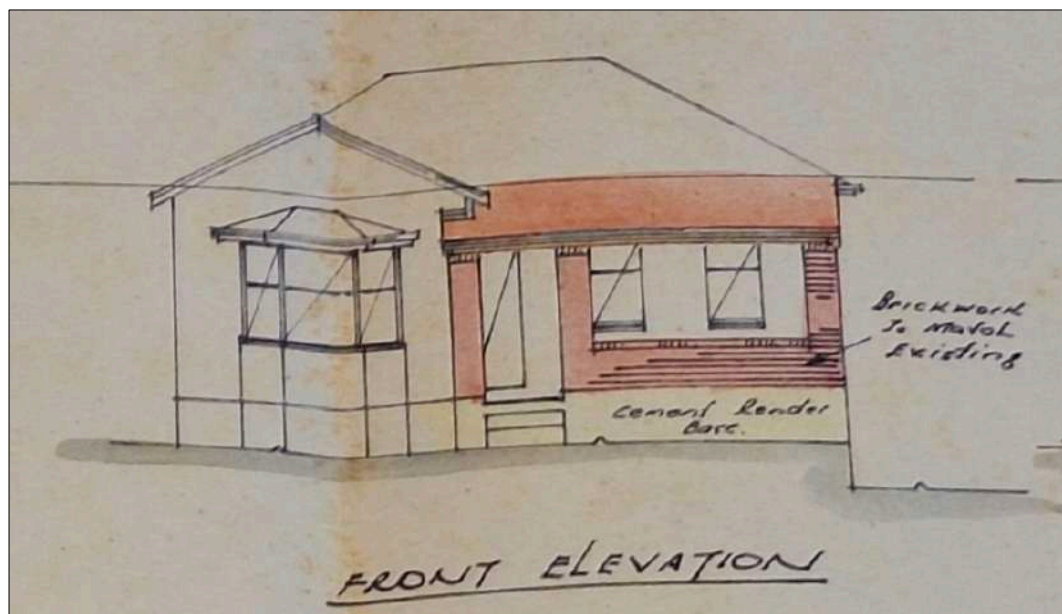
The proposed works from DA1953/252. The single storey scale of the dwelling can be understood in this elevation. DA1953/252.
